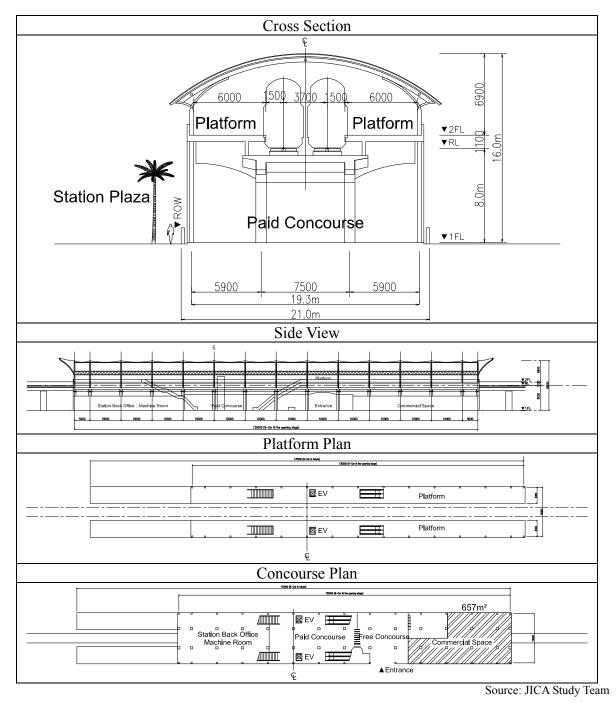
Station Plan (Elevated Side, Ground Concourse)
